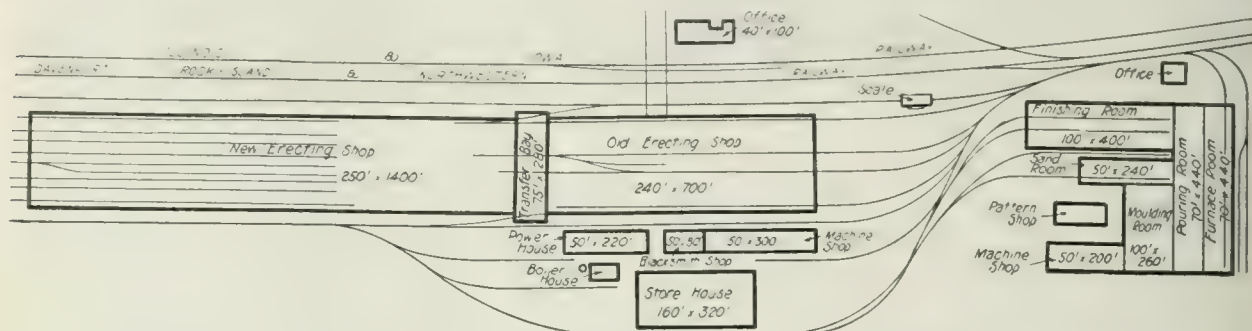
Plan of the Plant of the Bettendorf Axle Company, Bettendorf, Iowa.
